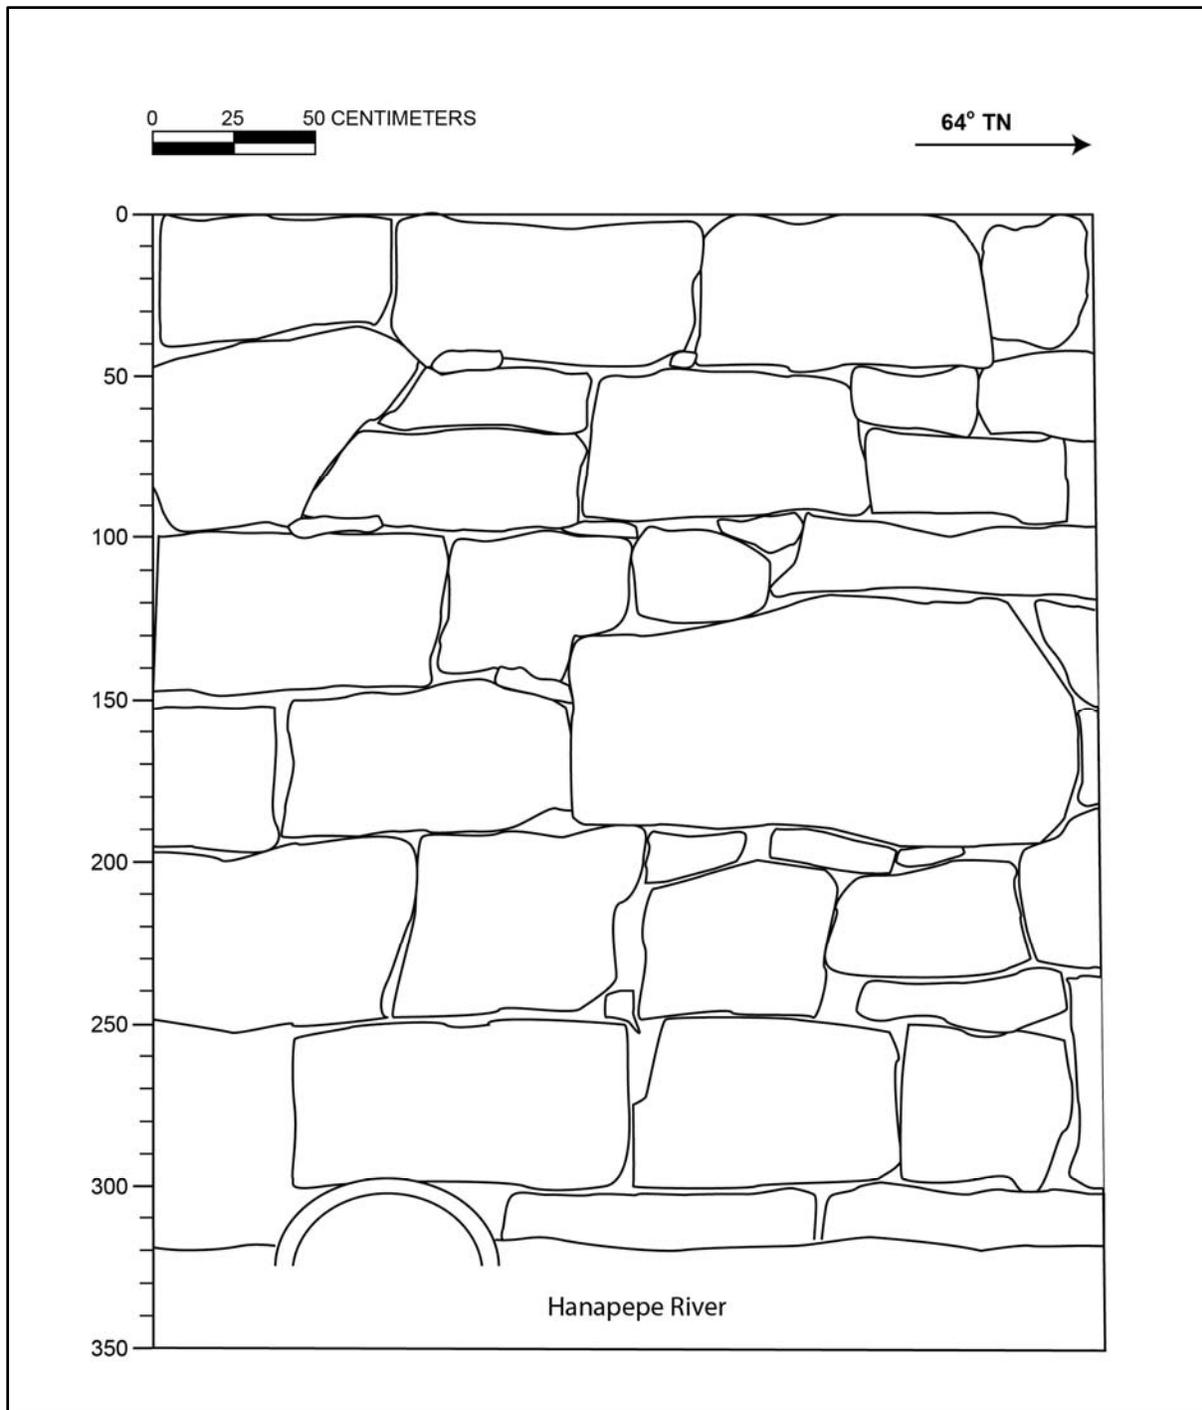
Profile map of the north portion of SIHP # -2282, retaining wall
